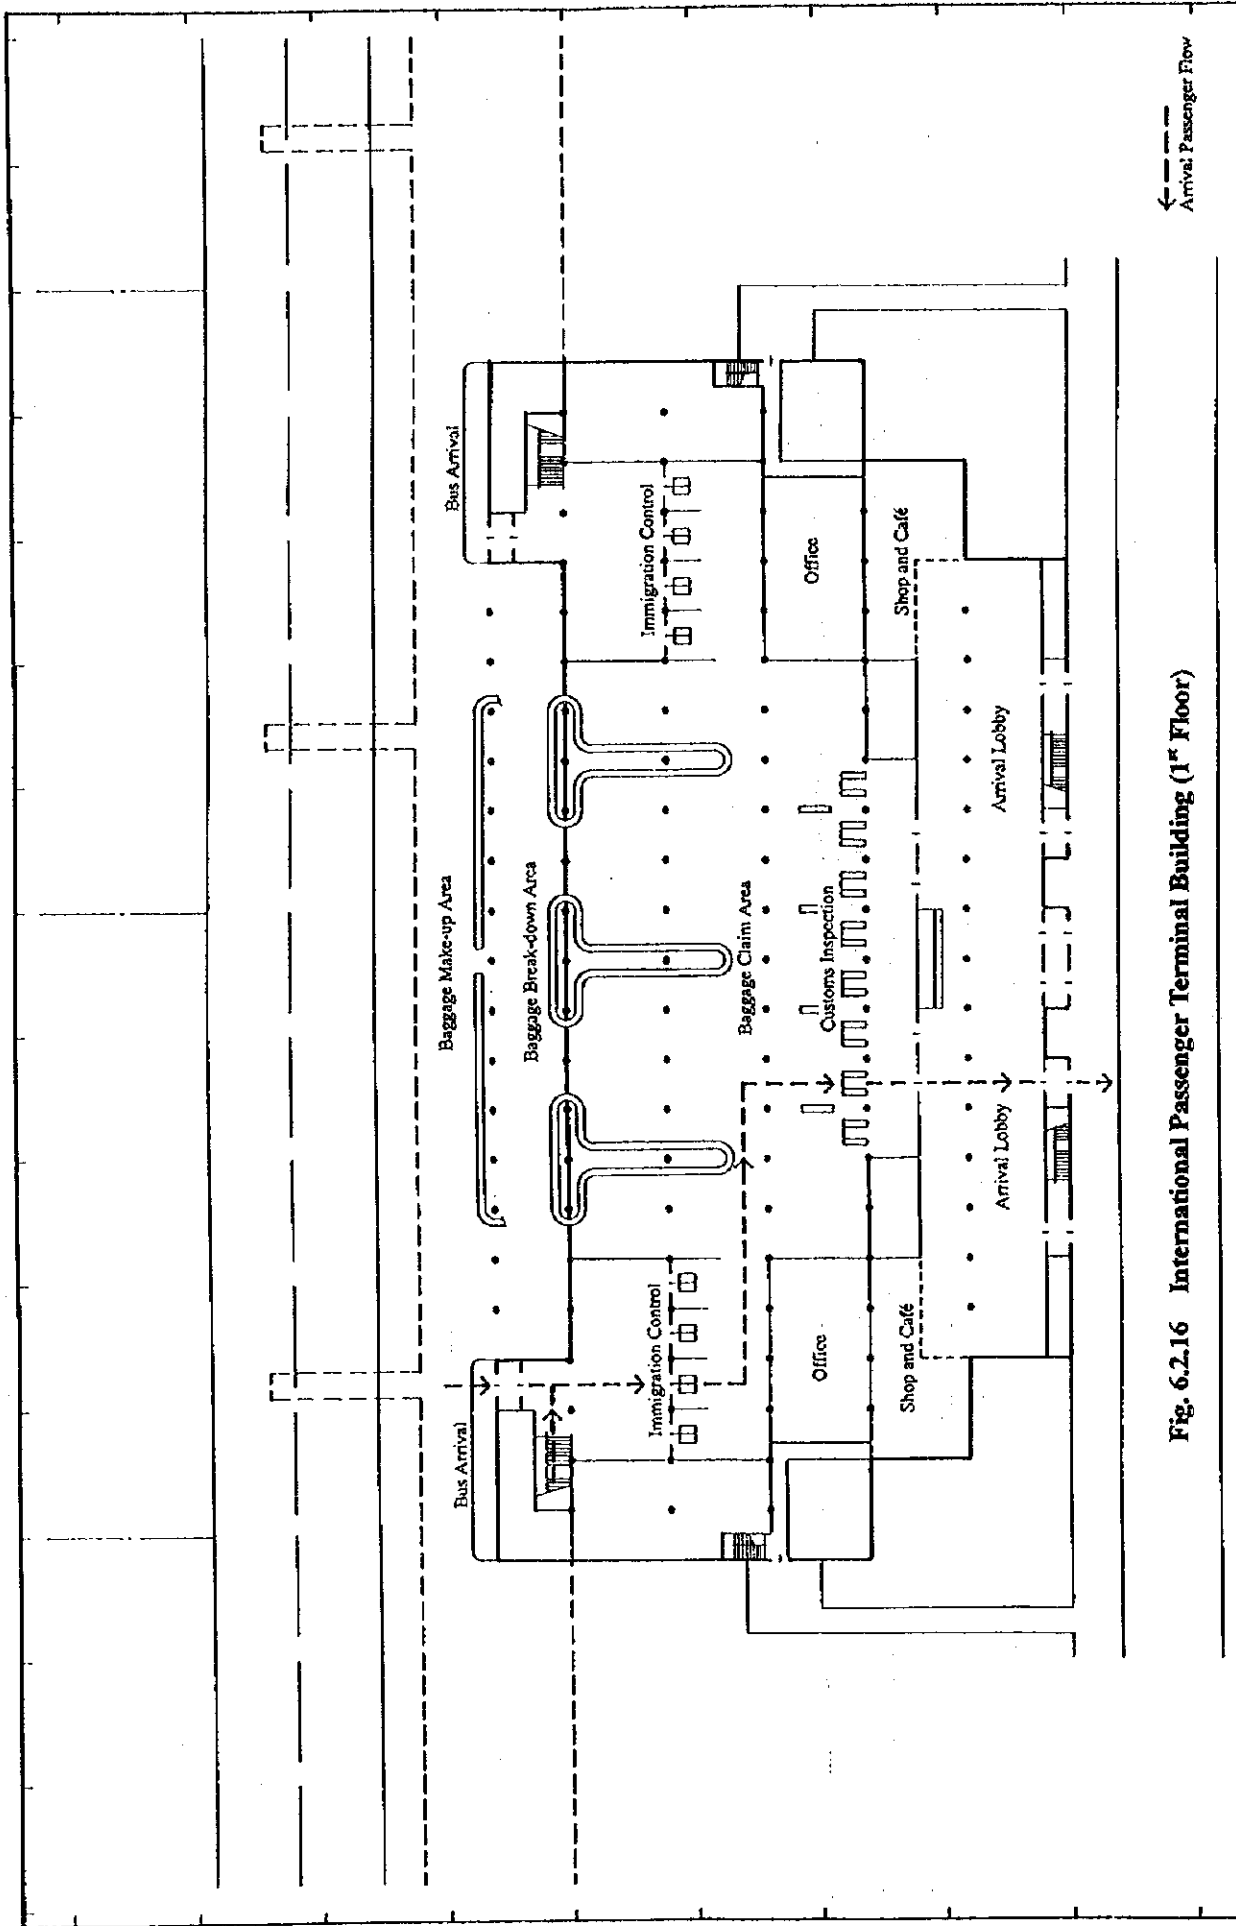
International Passenger Terminal Building (1st Floor)
